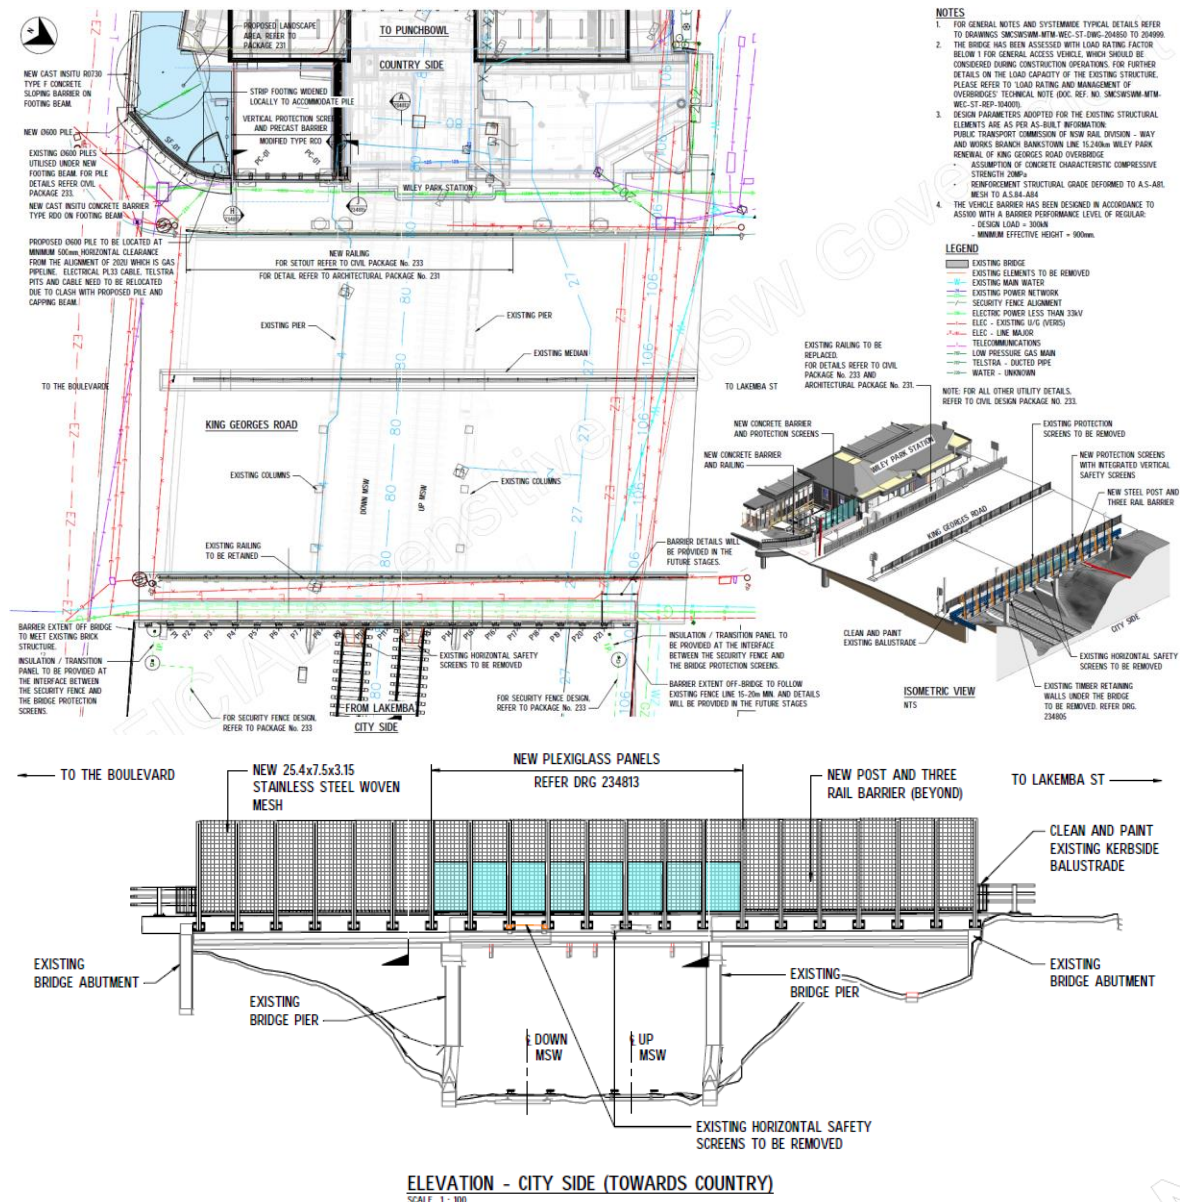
Plans of treatment works for King Georges Road Bridge (Source: Metron T2M 2022, provided by ARCH Artifex)
